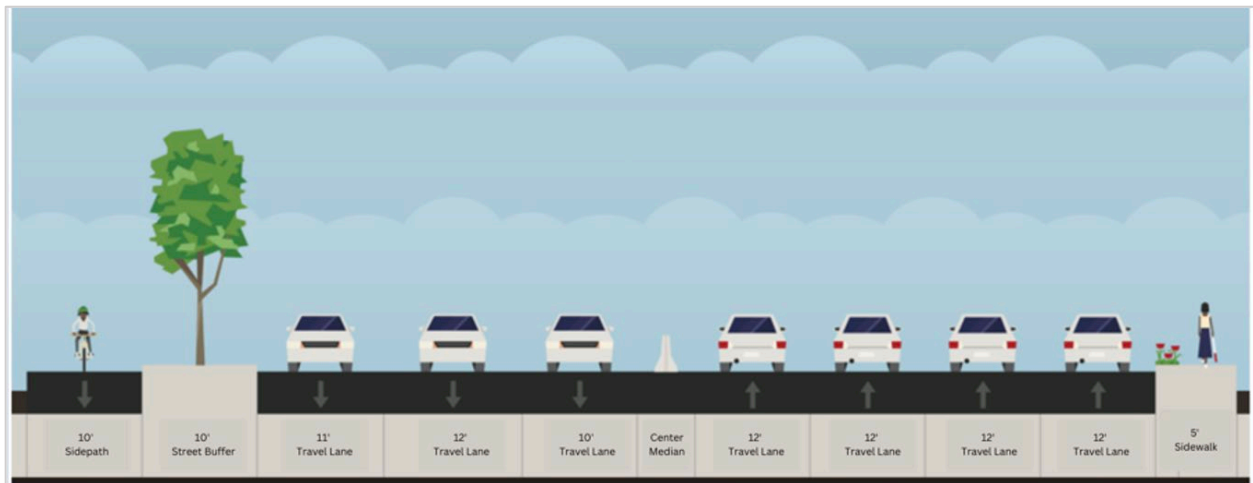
Proposed roadway cross-section of Old Columbia Pike, as conditioned
